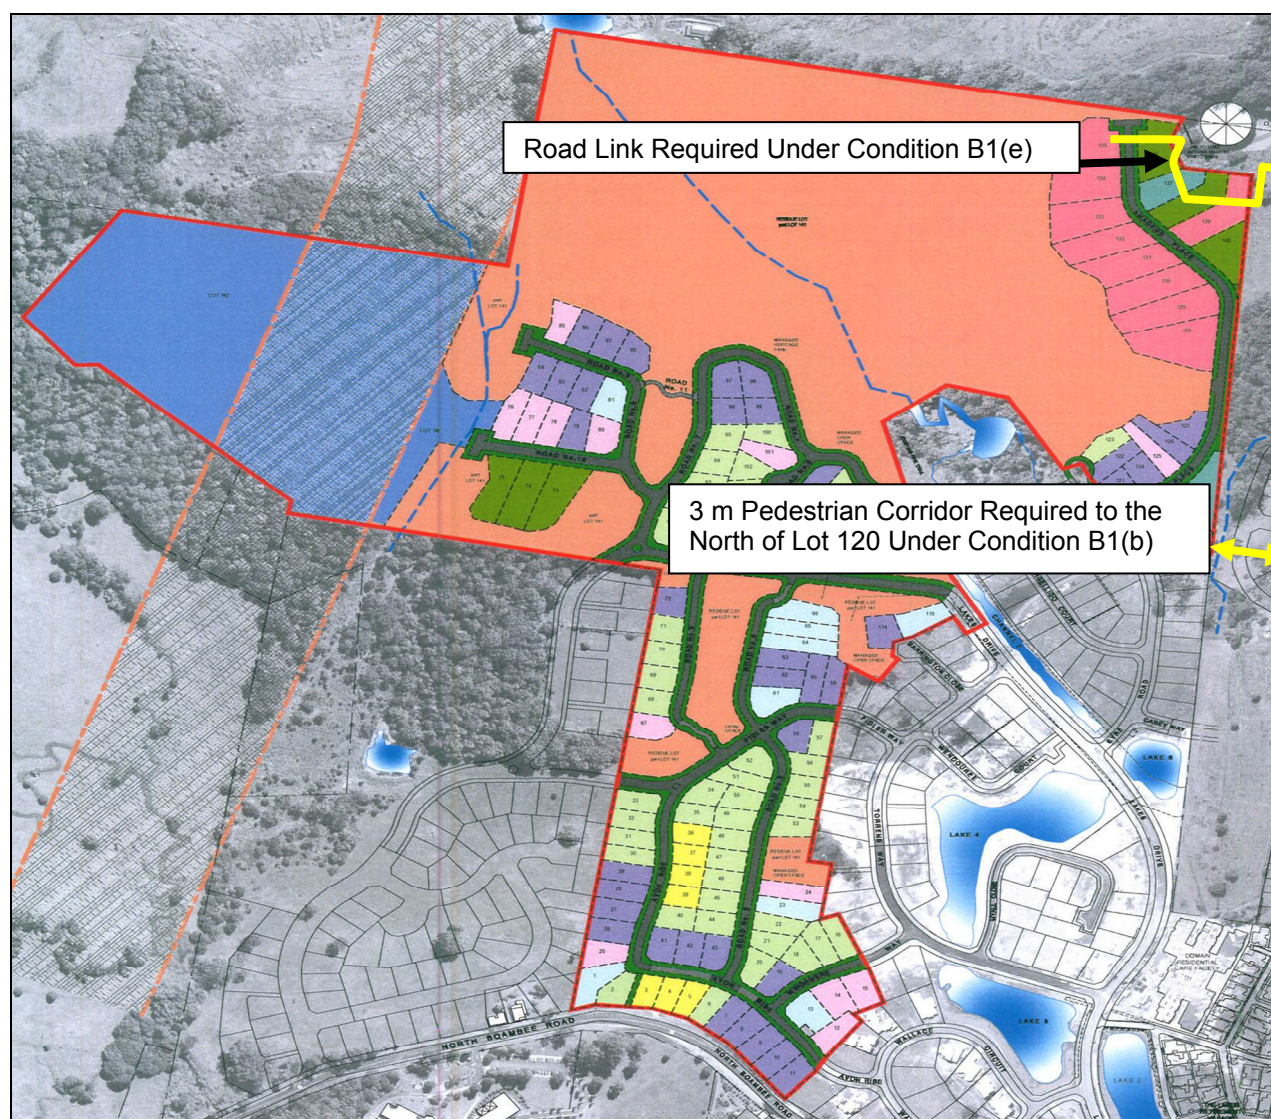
Pedestrian and Road Links Required under Condition B1(b) and (c)
